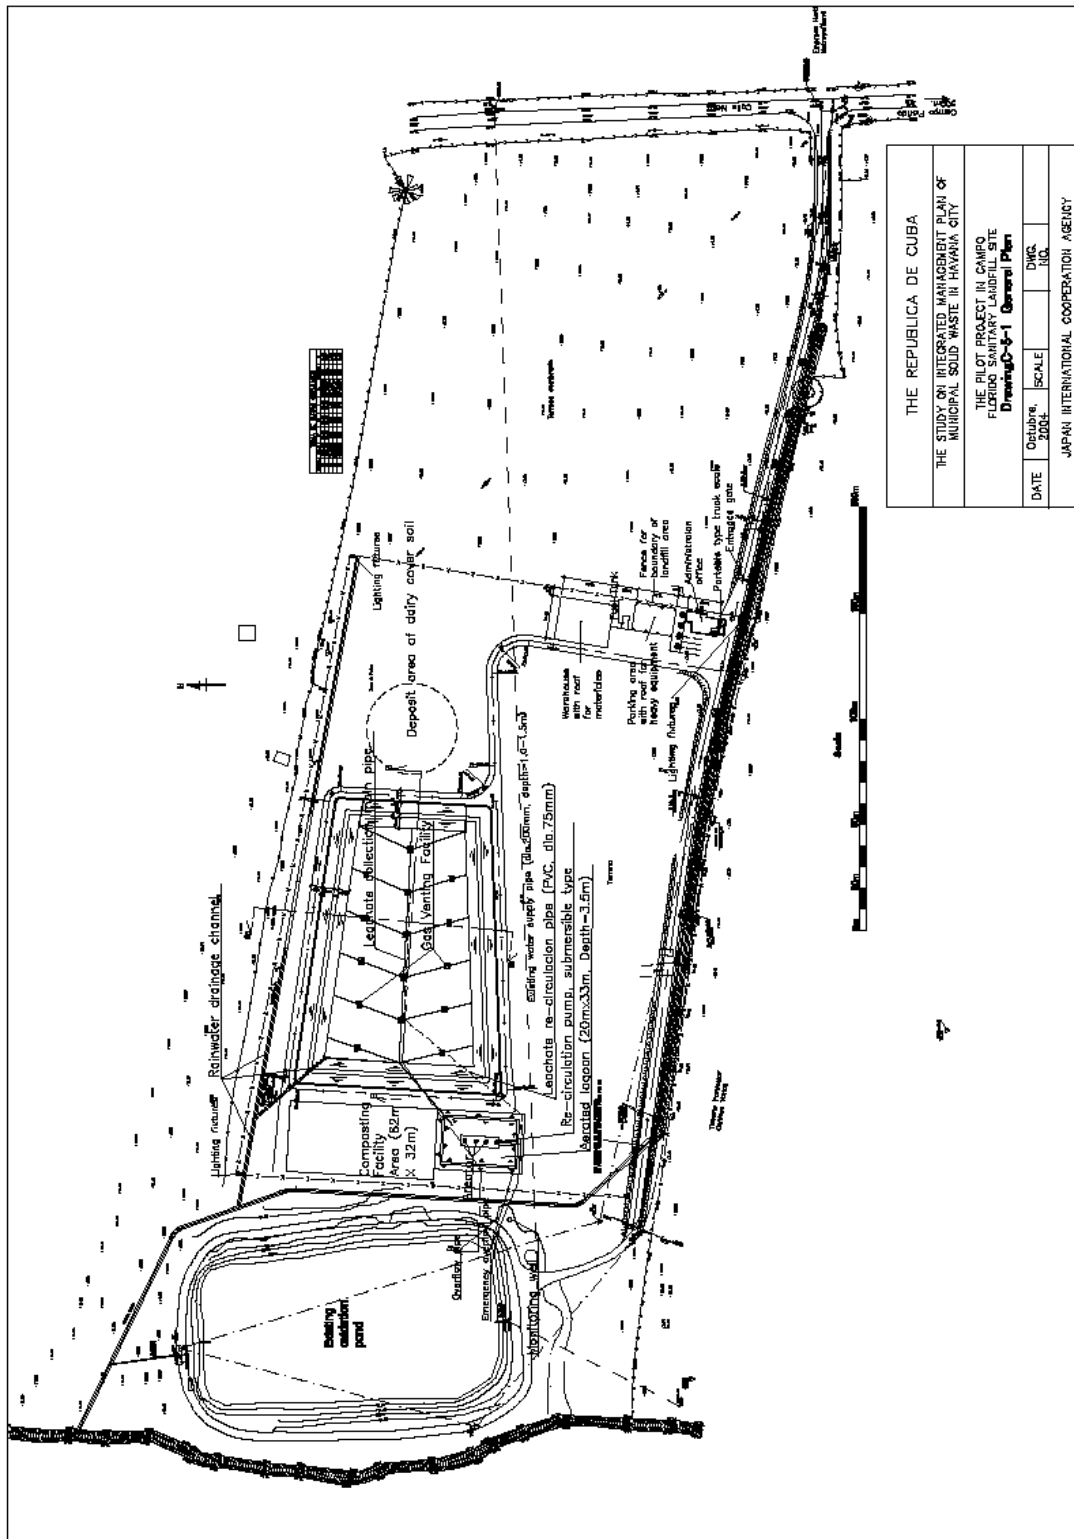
General Plan of Pilot Project in Campo Florido Landfill Site
